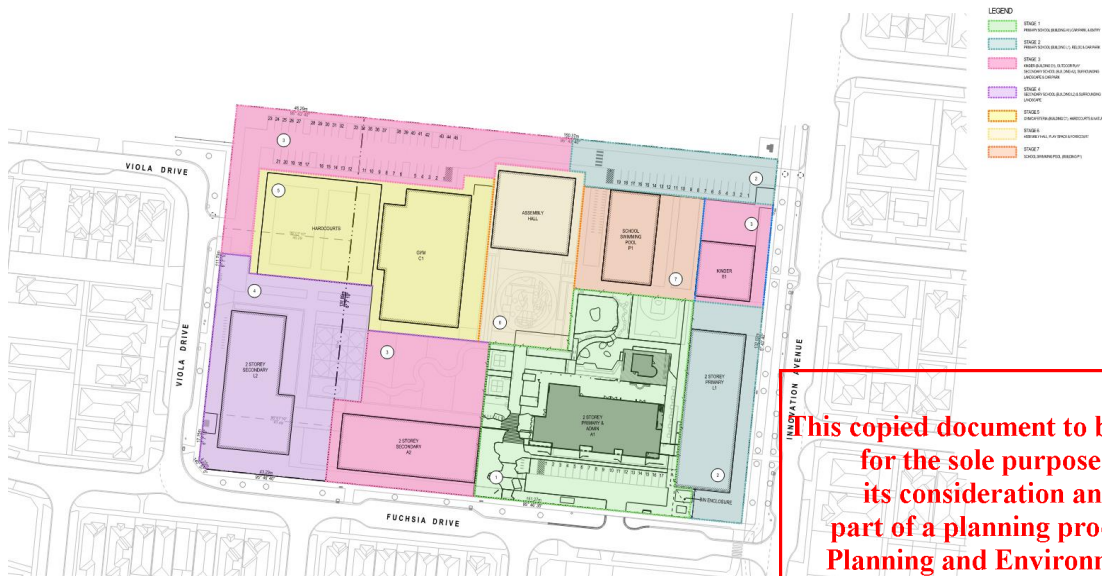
Proposed Staging Plan, prepared by LAW Architects, TP05 excerpt.
